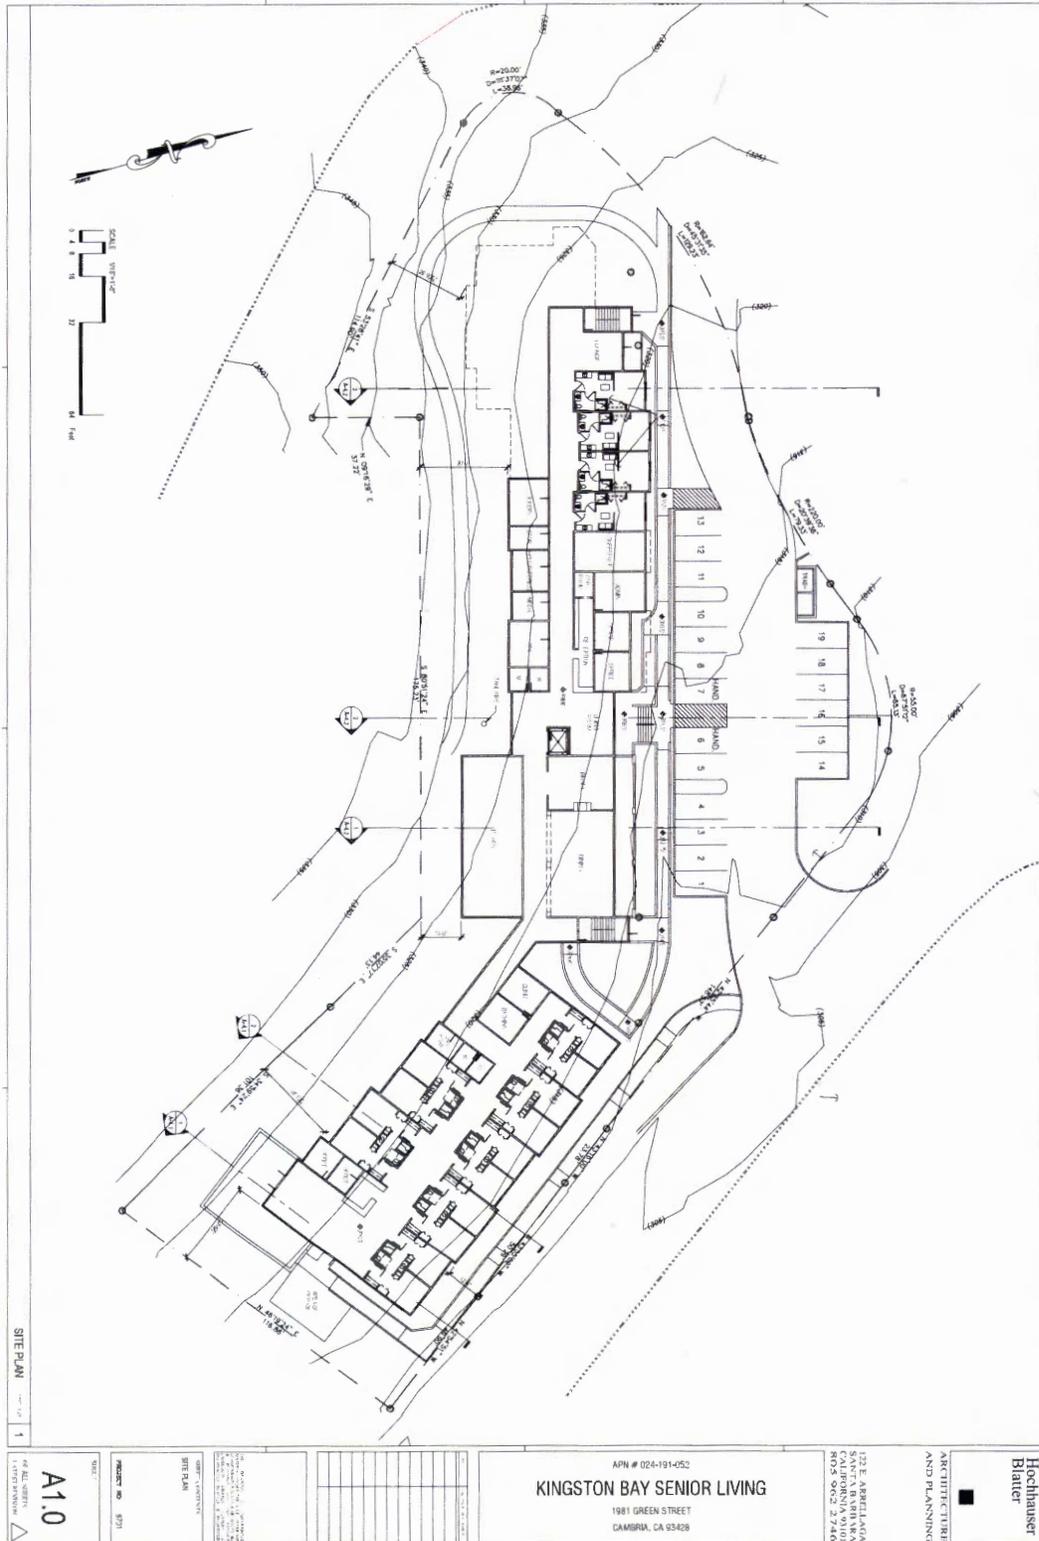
Kingston Bay Senior Living site design plan. A larger version of this map will be provided by the applicant.
